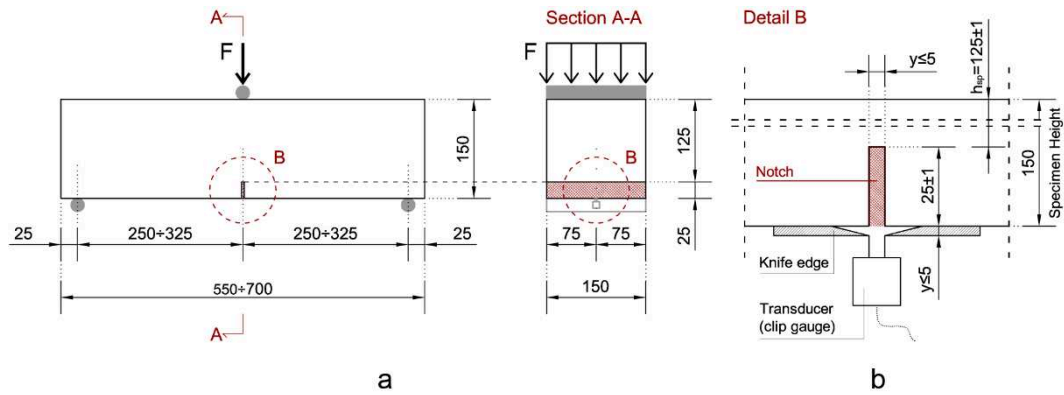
Three-point bending test set-up according to EN 14651 (EN 14651, 2005): a) set up and specimen dimensions; b) details of the notch and the transducer
